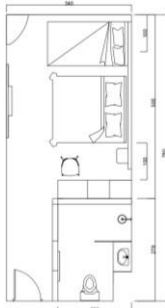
Layout sketch of Deluxe Double Room (Azkia, 2023)
